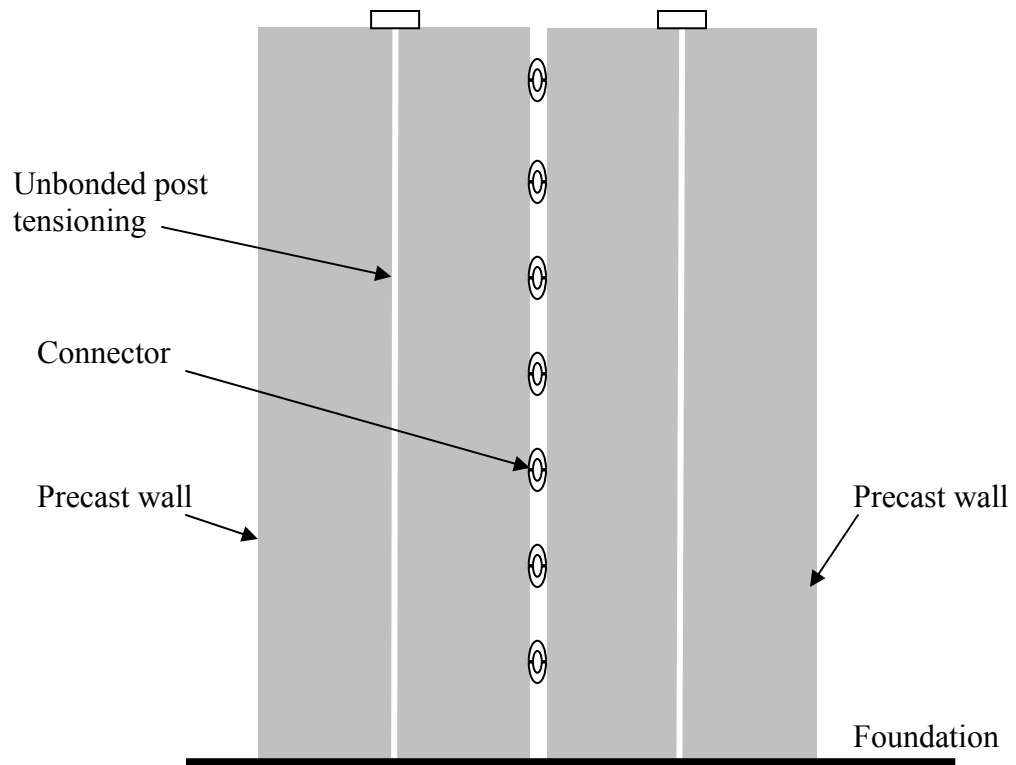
Illustration of a unbonded precast post tensioned jointed wall system
